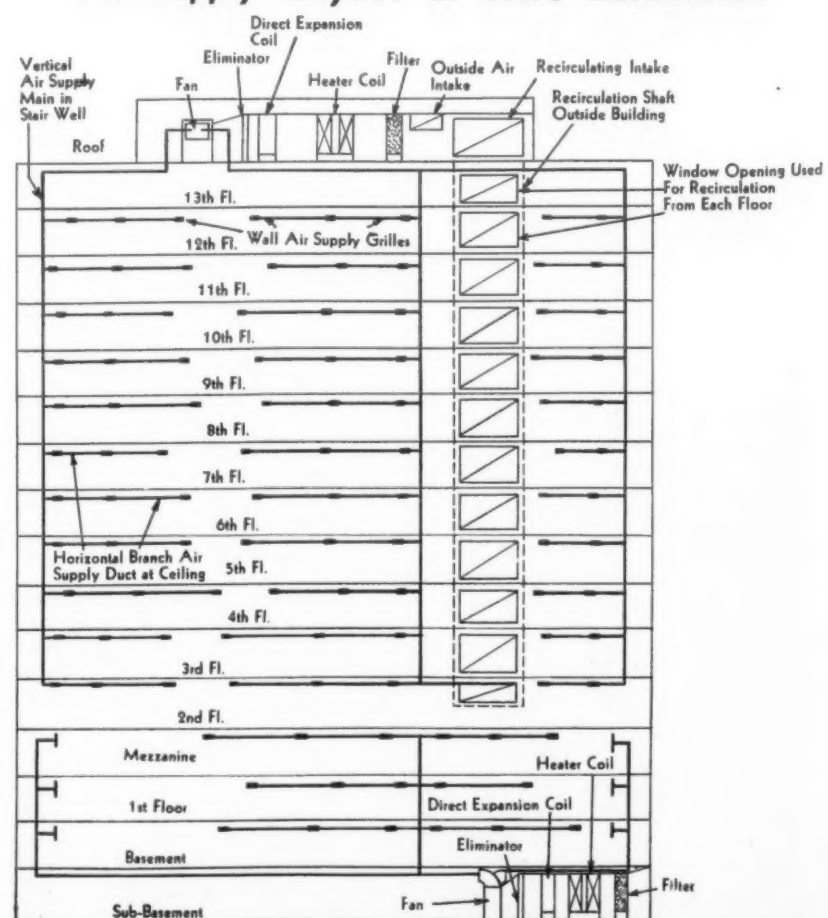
Drawing showing layout of air distributing and recirculating system in the air-conditioning installation made in Peoples Outfitting Co.
